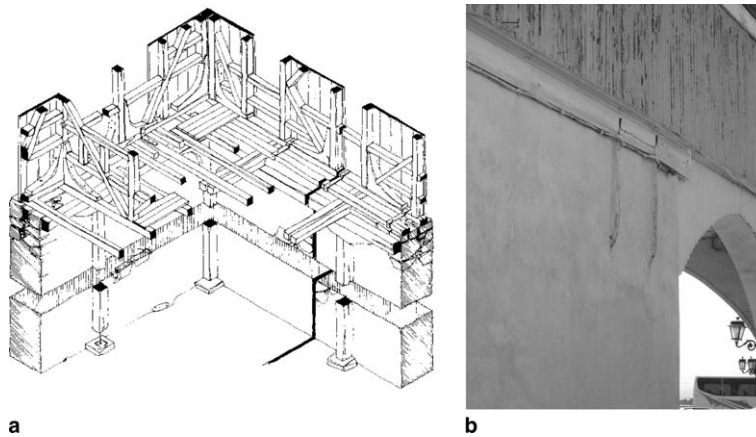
(a) Connection between timber elements; (b) metal ties connecting timber floor to stone masonry.
